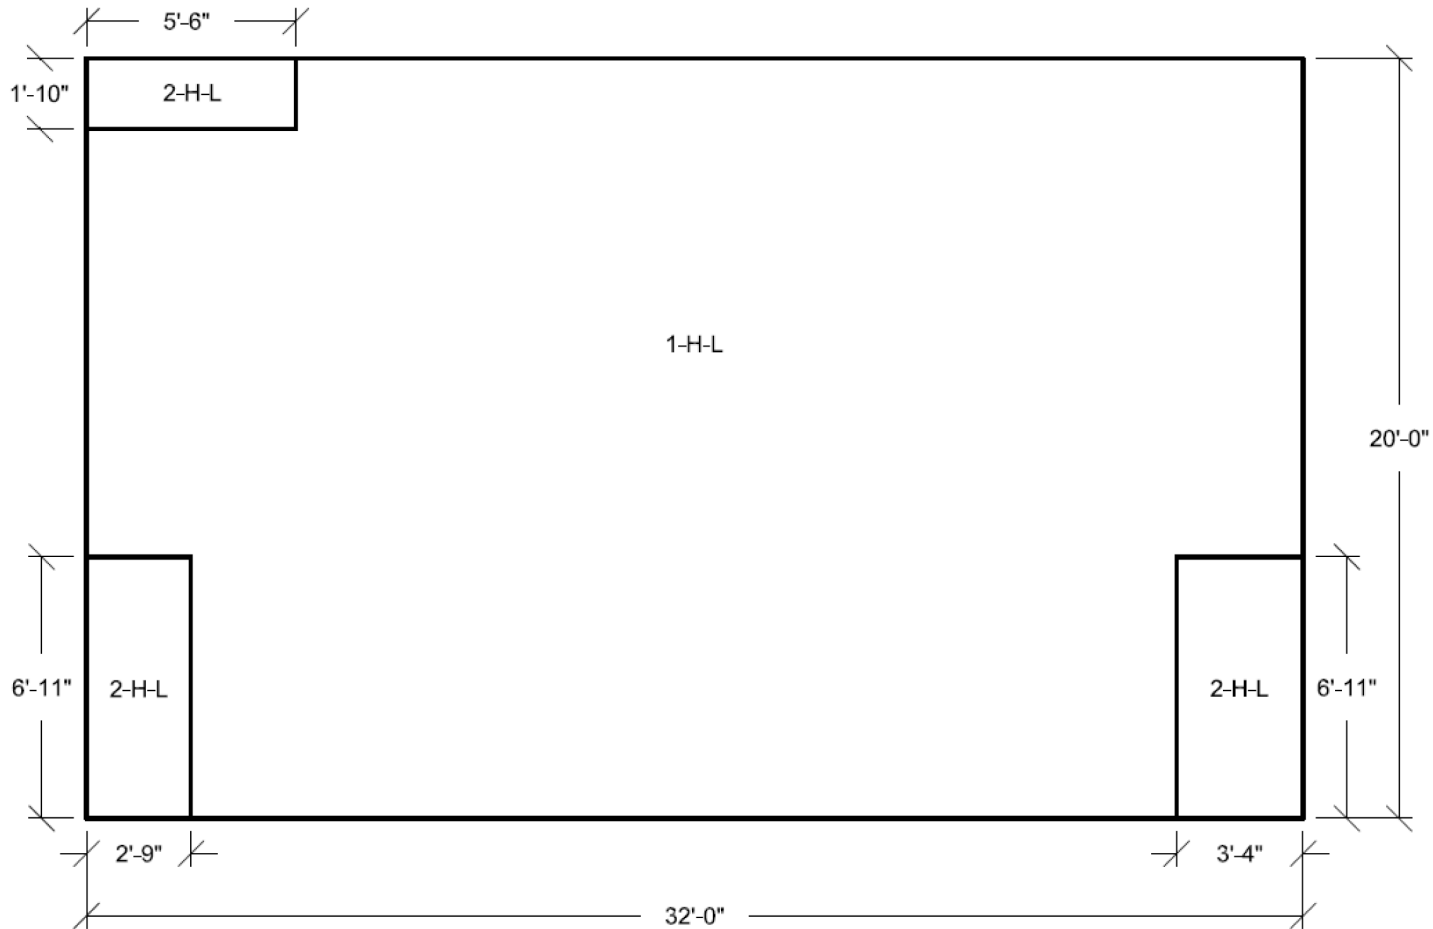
H.6-195 DGFOV Wall 14 Looking From Outside
